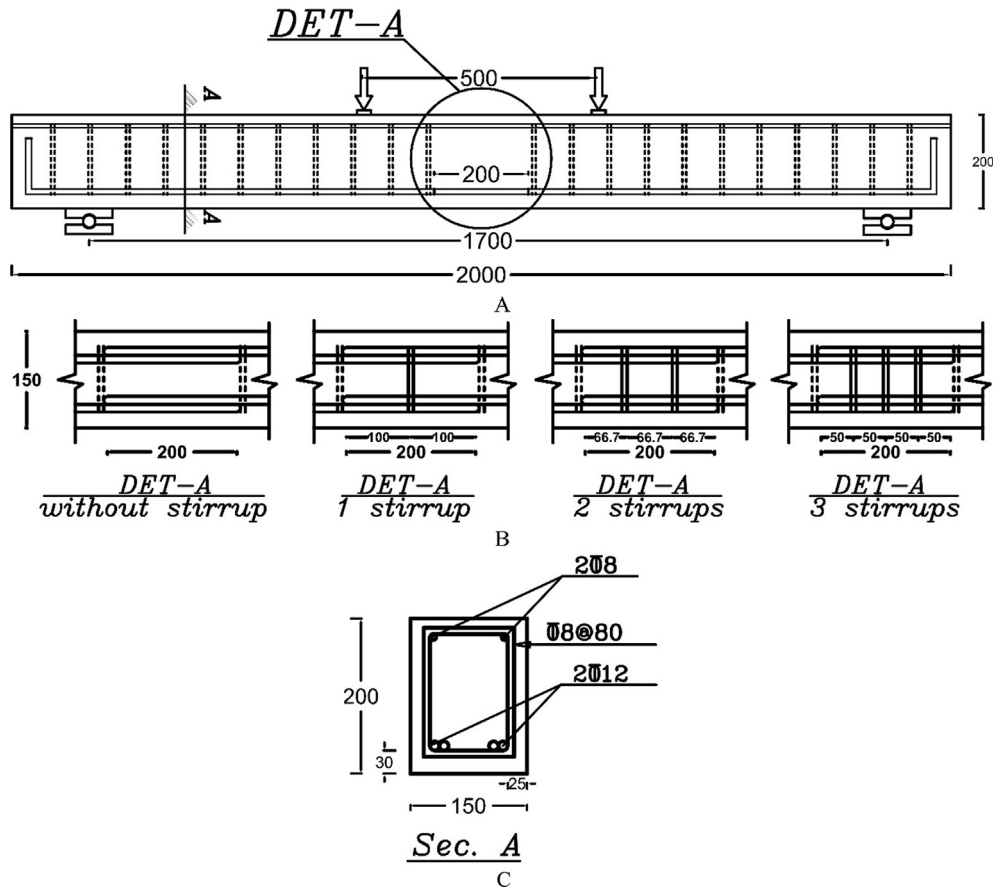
Specimen details: A. Casting and testing position, B. The splice region and C. Cross section.
